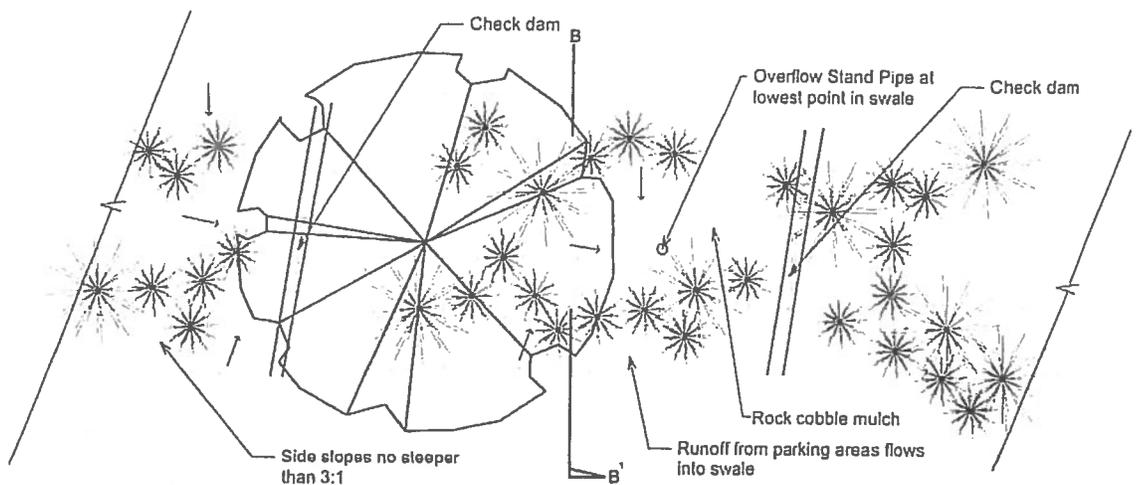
VEGETATED SWALE PLAN (EXAMPLE)
